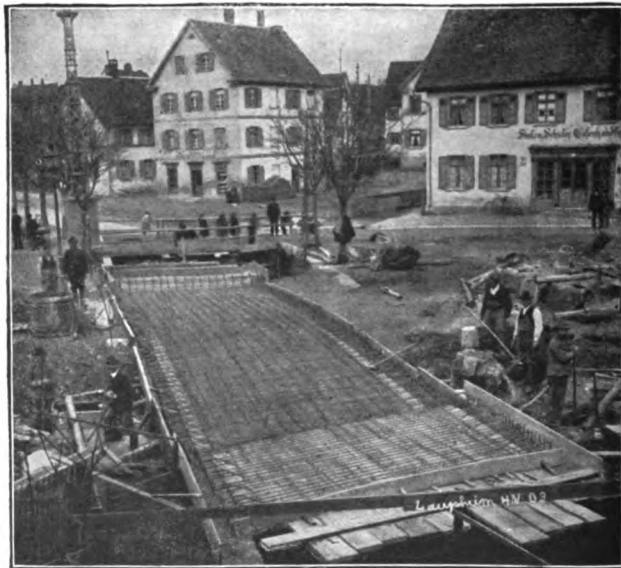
Laufbach Bridge in Laupheim. Placing Reinforcement.
